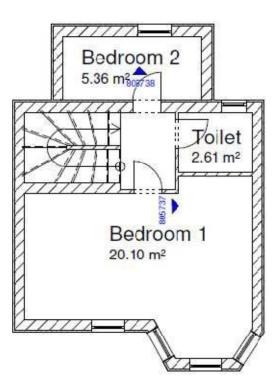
Plan of the first floor of KLG Hagedorn, House 1 showing the data logger locations
